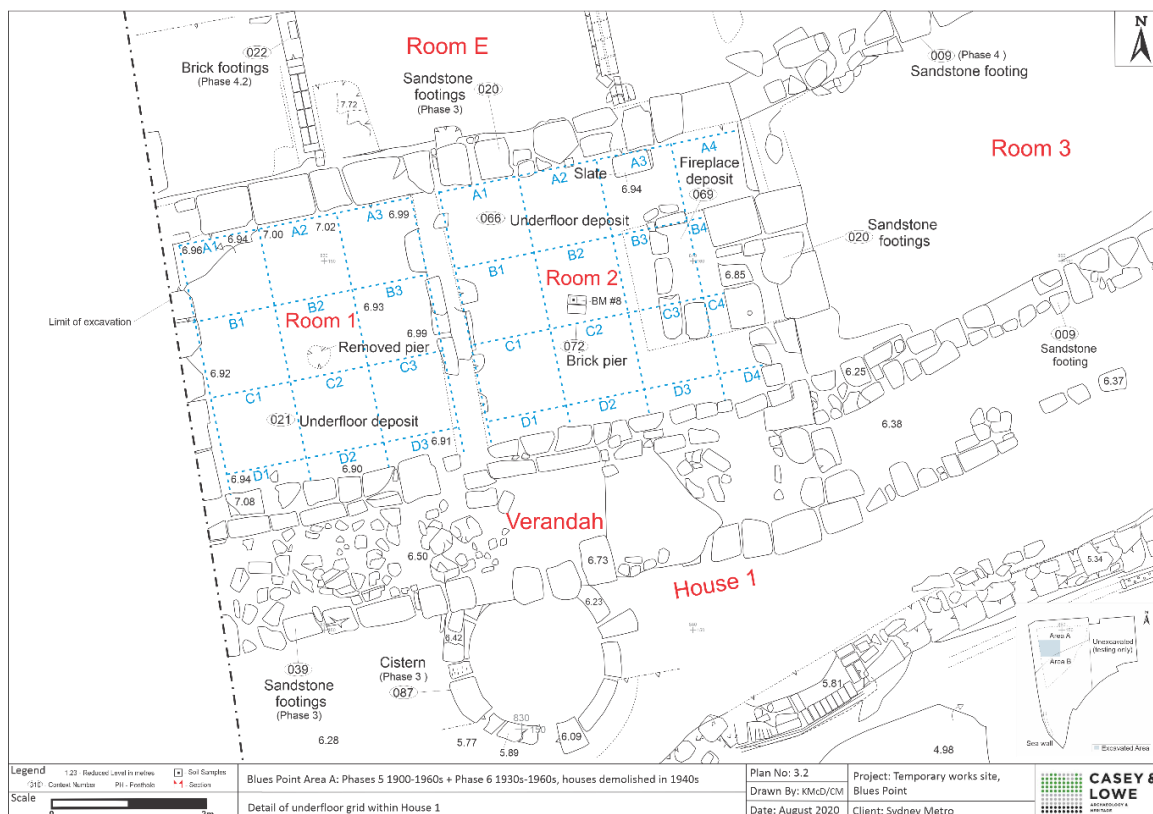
Plan of the underfloor grid within Rooms 1 and 2, House 1, showing underfloor deposits (021), (066) and (069).
